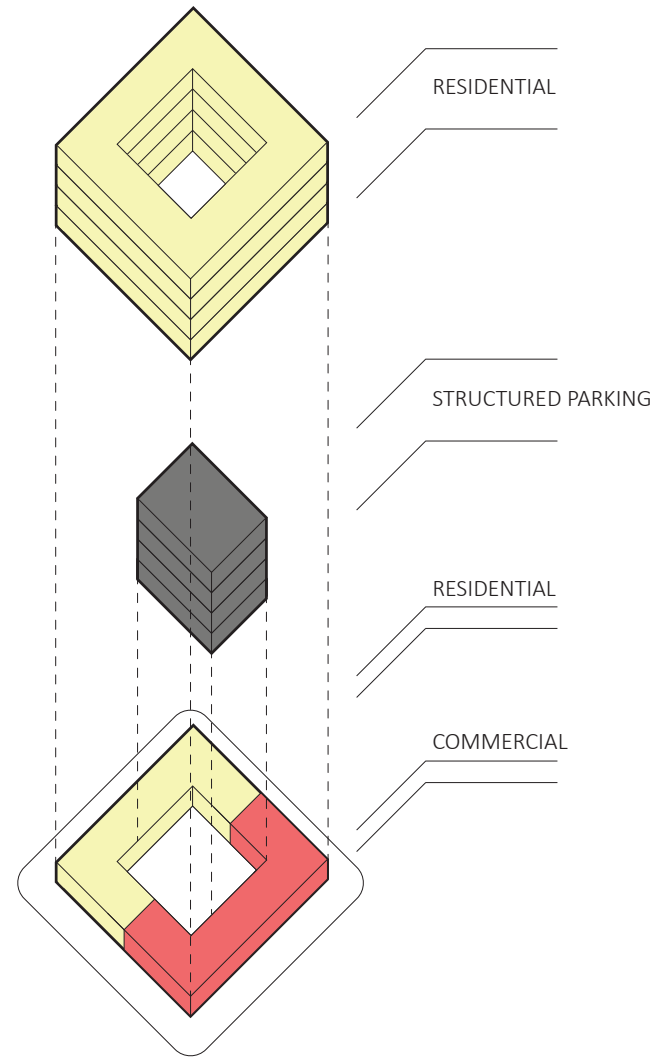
Residential Mixed-Use Perimeter Block Building
